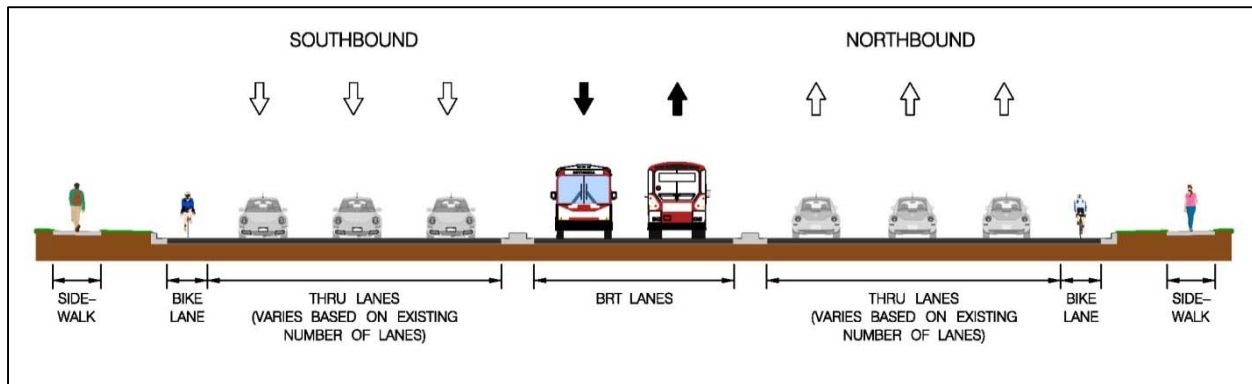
Alternative 4A - Section 3: Rockville Town Center
